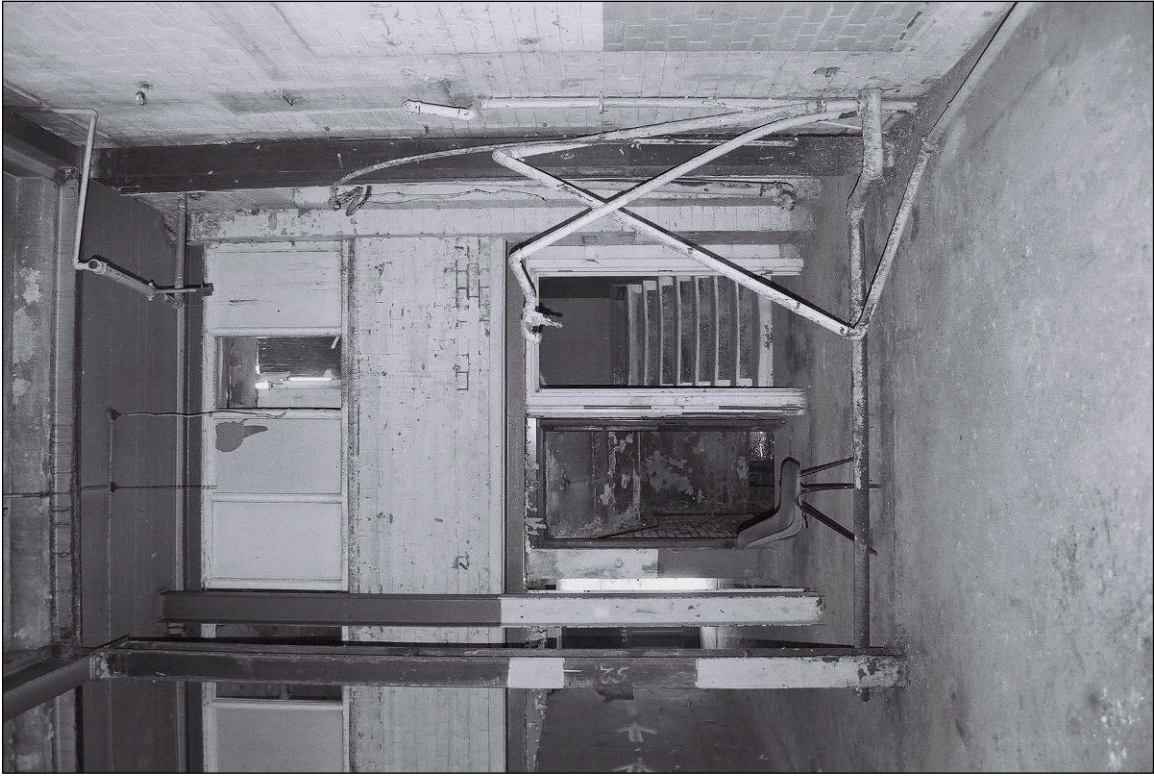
Shot of stairway and mezzanine windows overlooking G5 (film 12.25)
